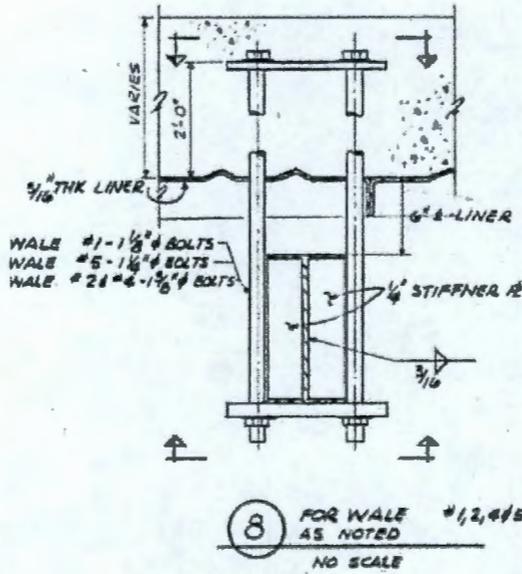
, 2, 4, & 5 to Concrete Arch Connection
